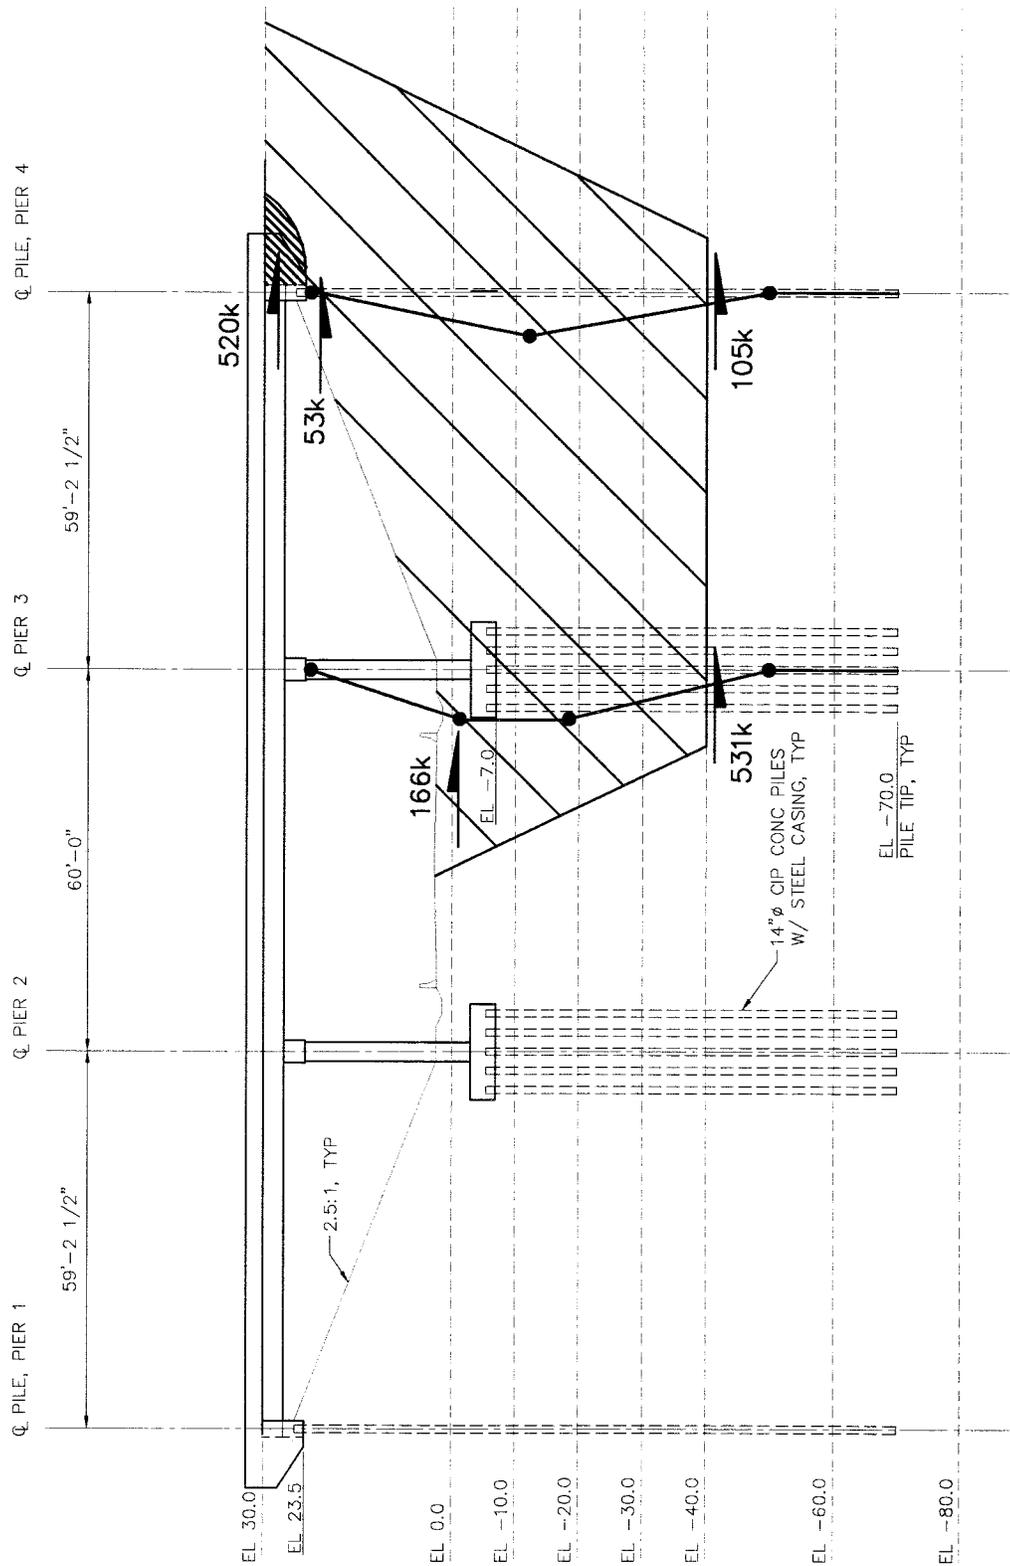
Pier 3 and Pier 4 Structural Forces Resisting Lateral Spreading
